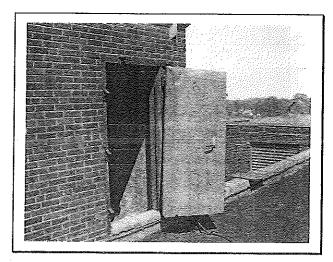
Viewing green roof entry door, Exterior – East side.
